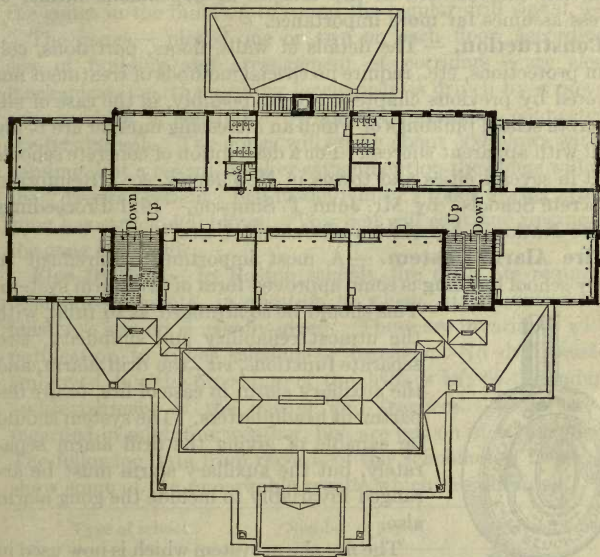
Second Floor Plan, Mozart School, Chicago.
